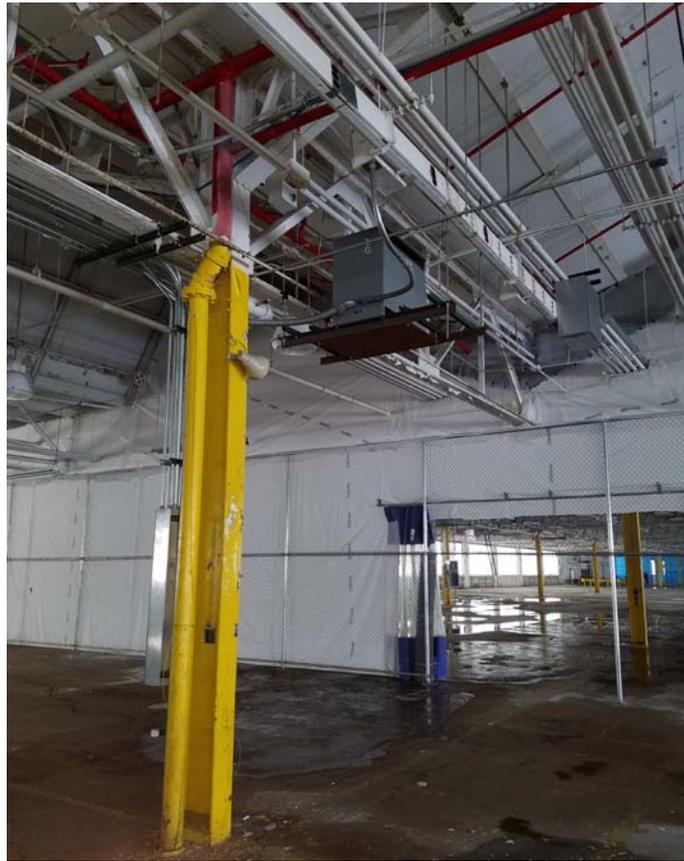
Ceiling Mounted Transformer, 2nd Floor
